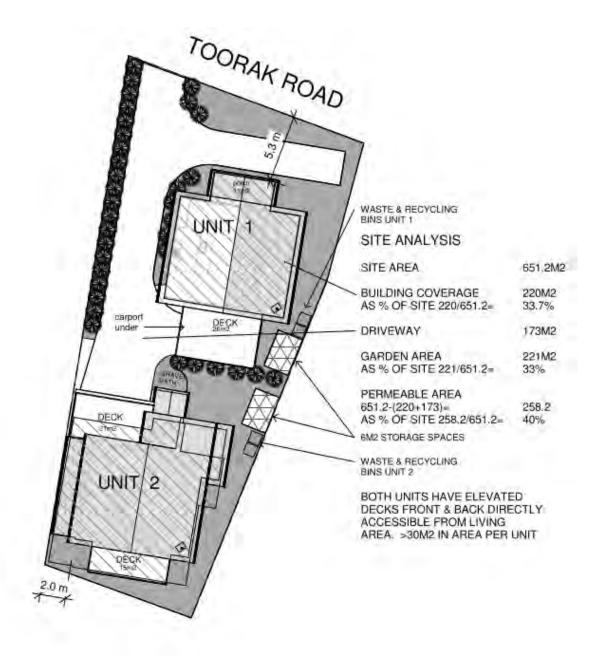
Shows the development layout on site including garden area, site coverage and permeability area figures.
